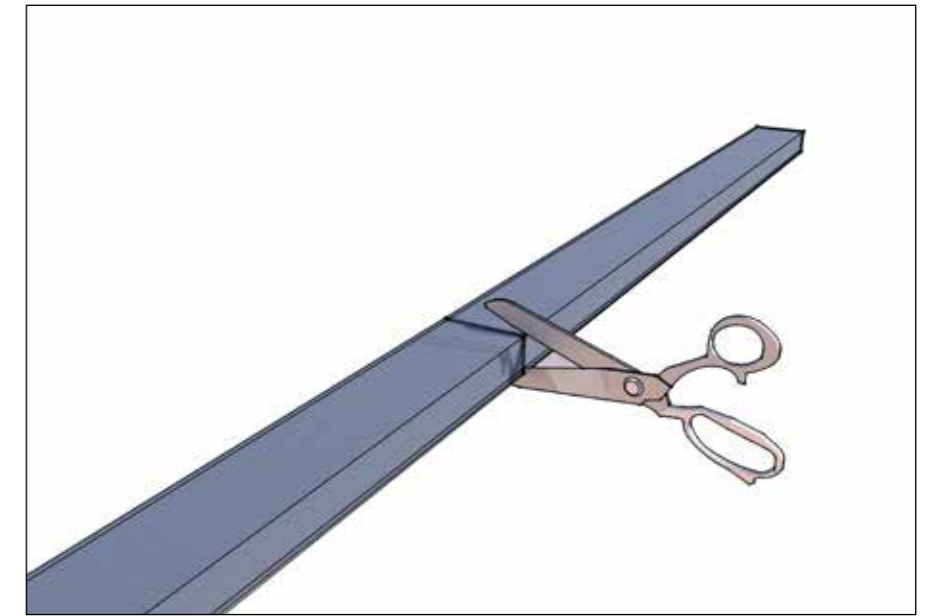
Cutting Spacetherm CBS / Spacetherm A2 CBS
